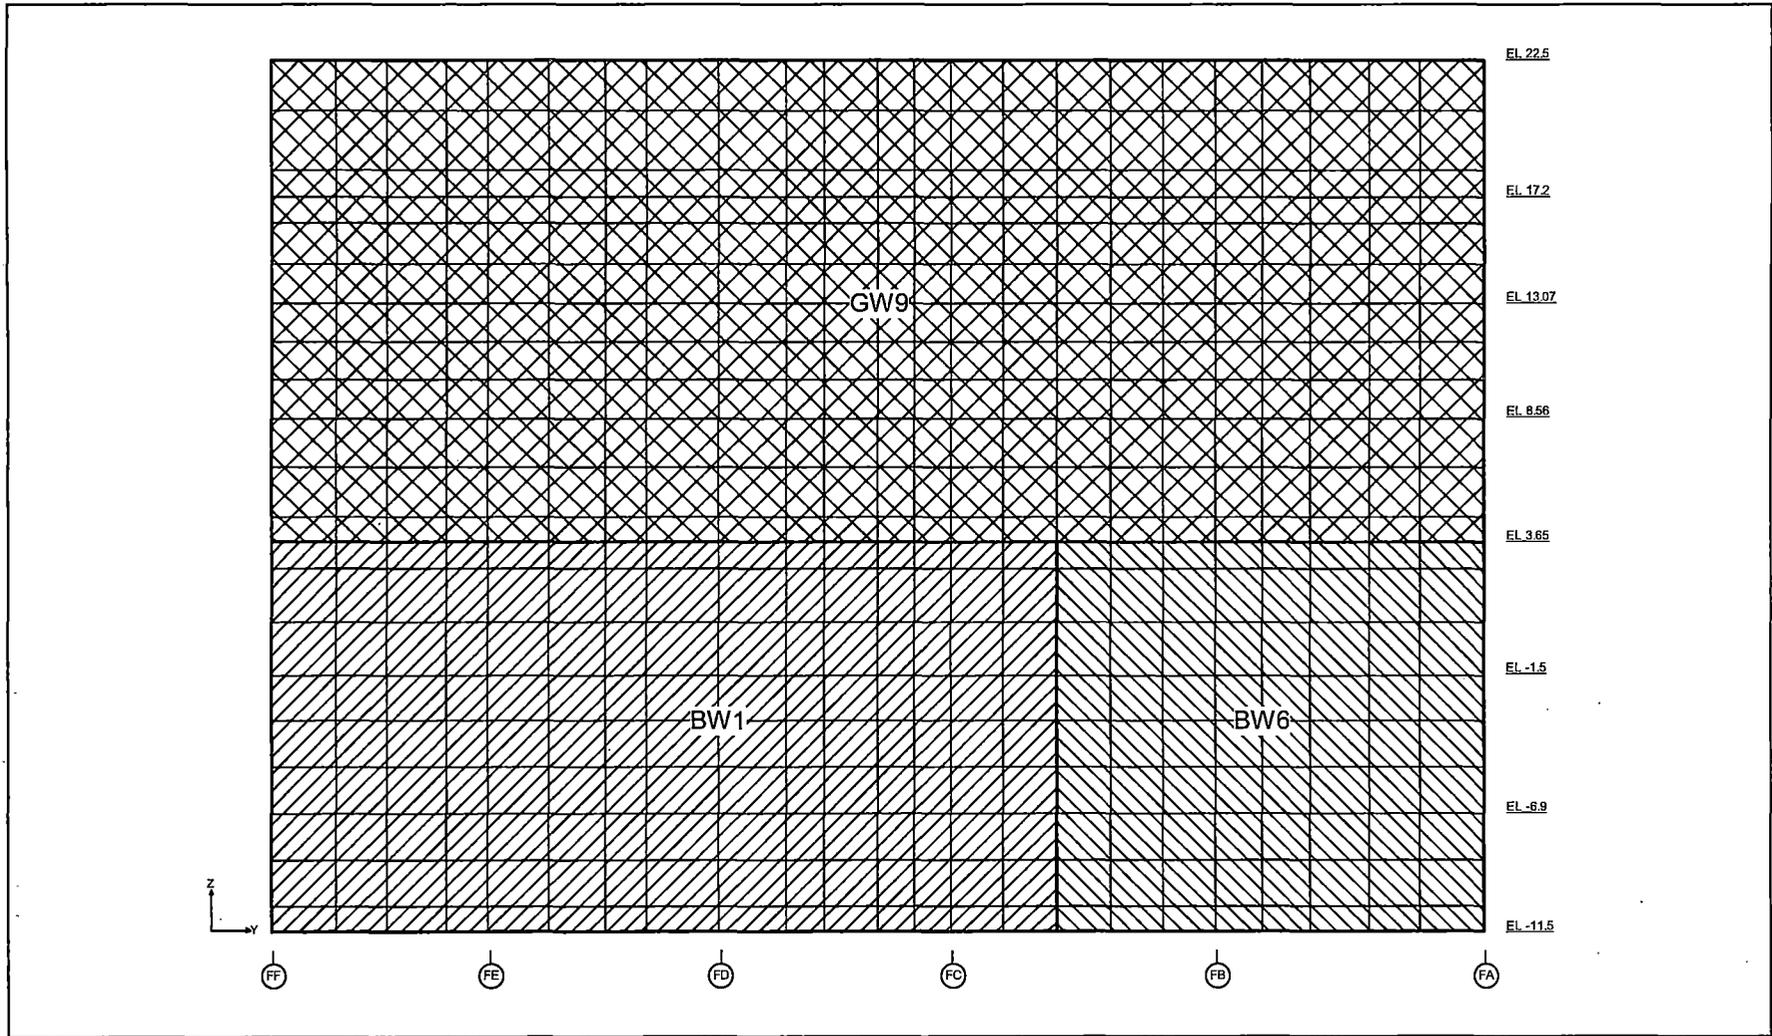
Application of Thermal Load on the External Wall (F3)
